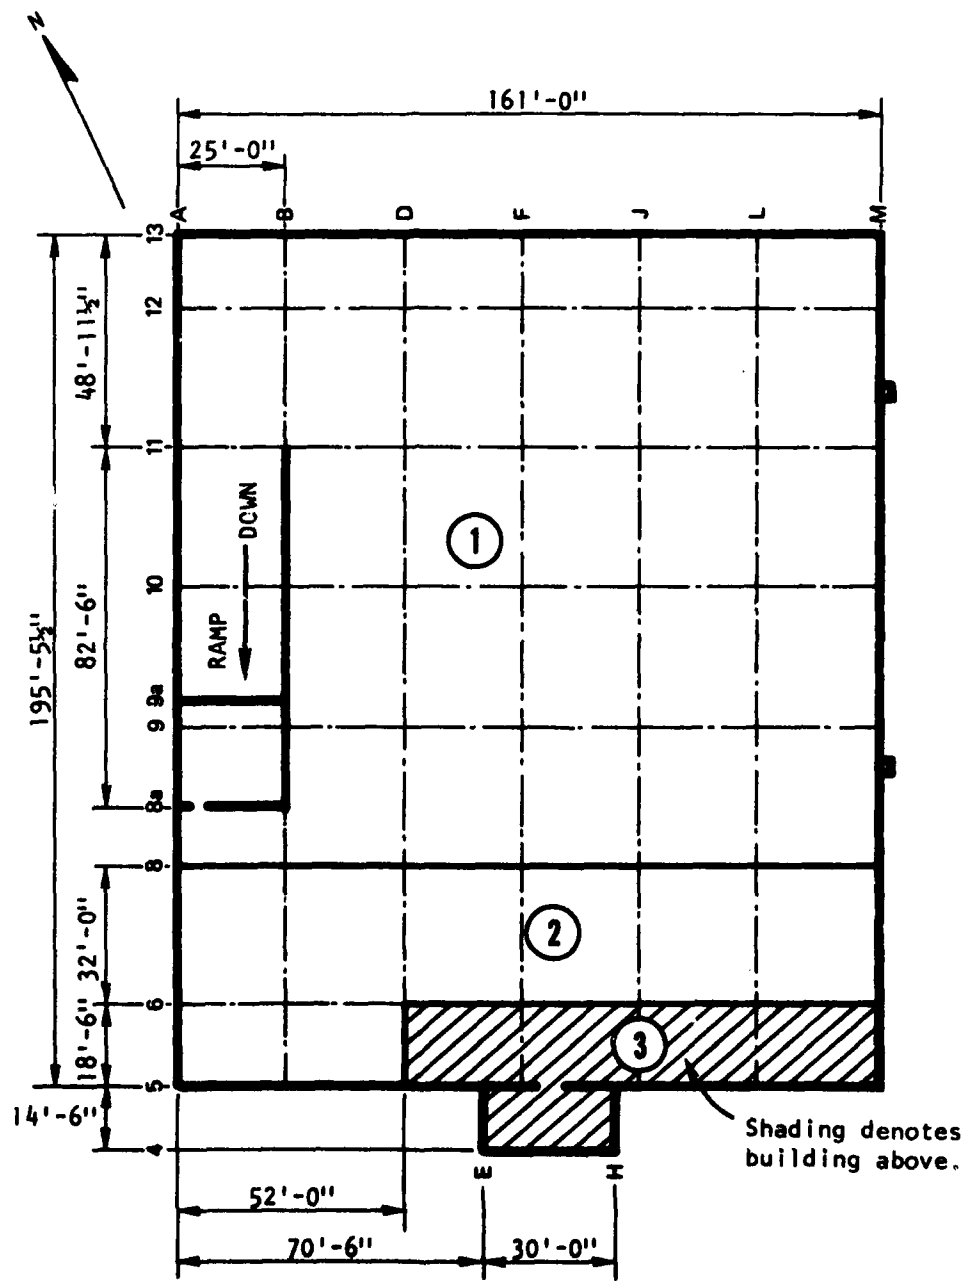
PLAN VIEW, MIDDLEFIELD PARKING GARAGE, SHOWING STRENGTH ZONES
